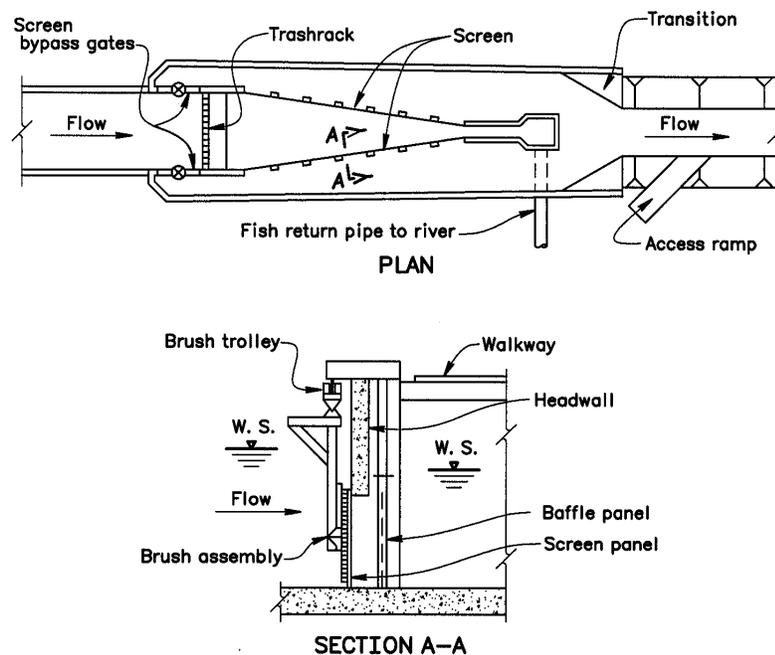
Intake with concrete head wall – Ice protection at Wapatox (Rainey, 1985).
